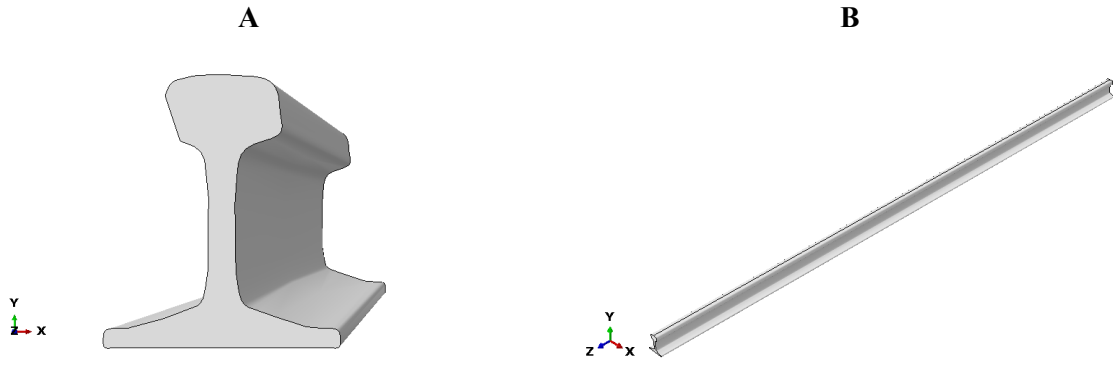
Solid geometry of the stock rail; (A) Perspective front view; (B) 3D plan view
